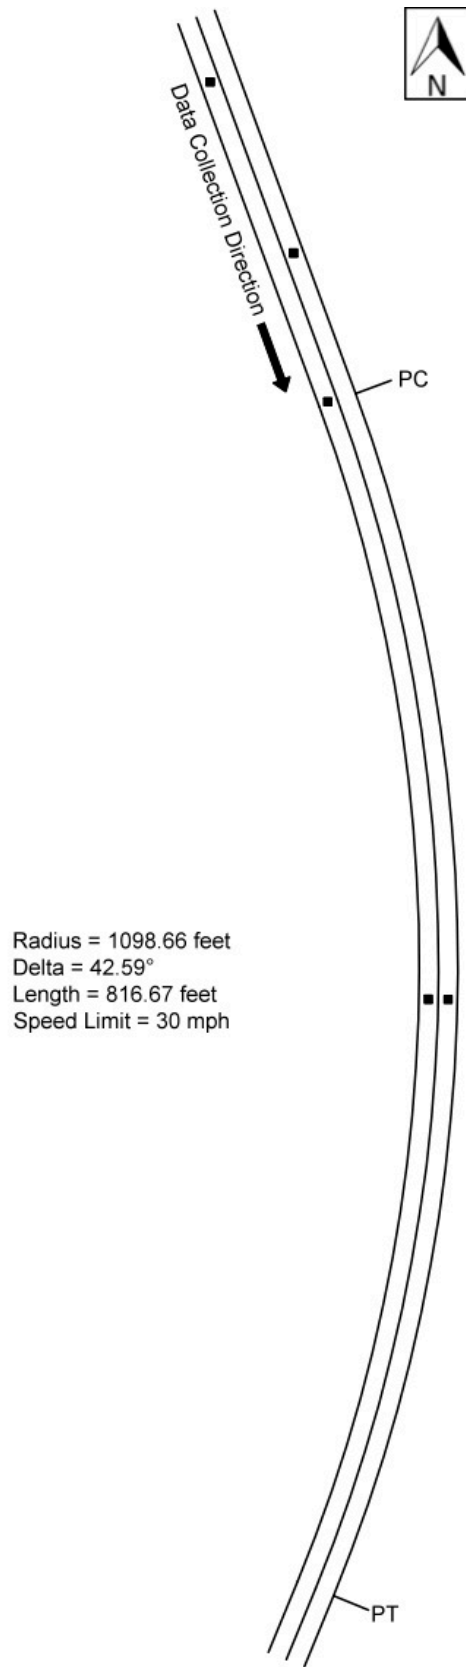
Diagram. Geometric layout of southbound Tucker Road (not to scale).
